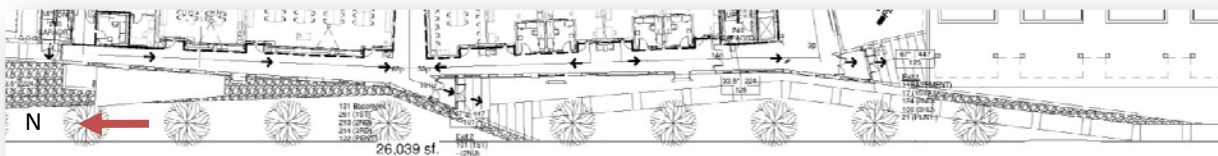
EXTERIOR PLAN VIEW OF THE WESTERN FACADE
